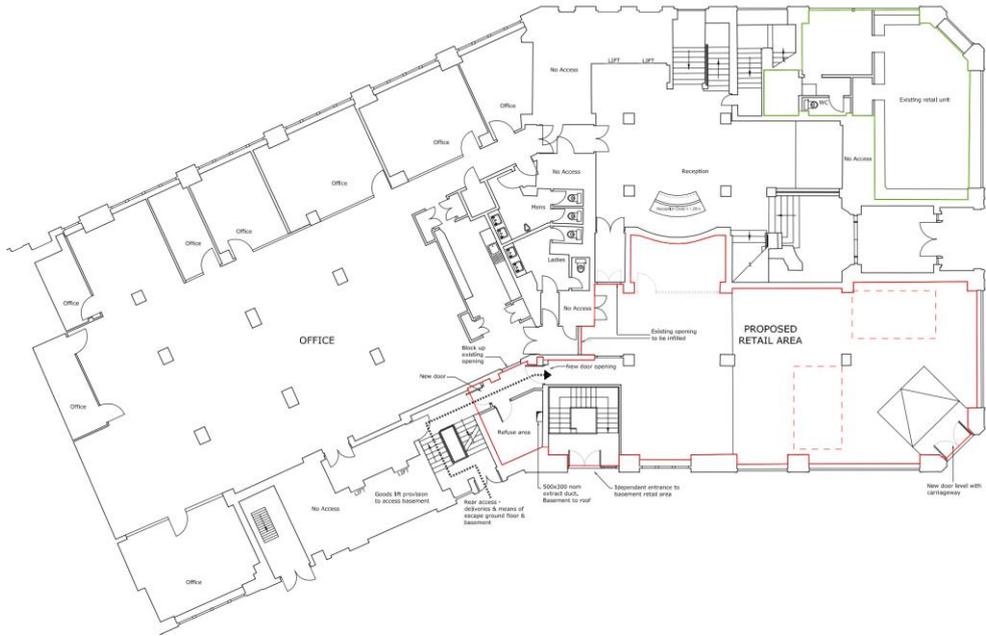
Extract from application 2015/4096/P showing the proposed ground floor plan
